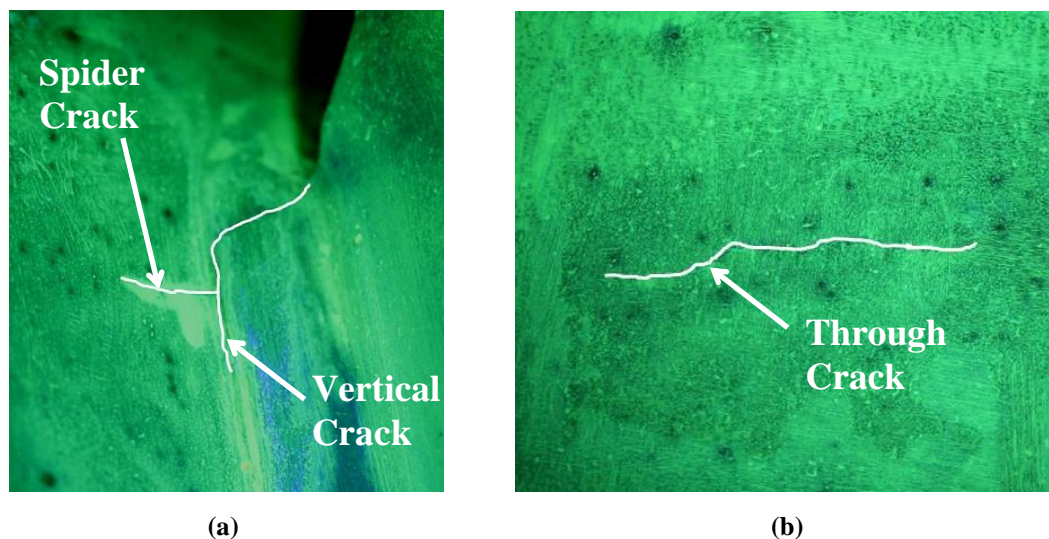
Crack definition for (a) interior side of girder web at cross frame connection plate and (b) exterior or fascia side of girder web.
